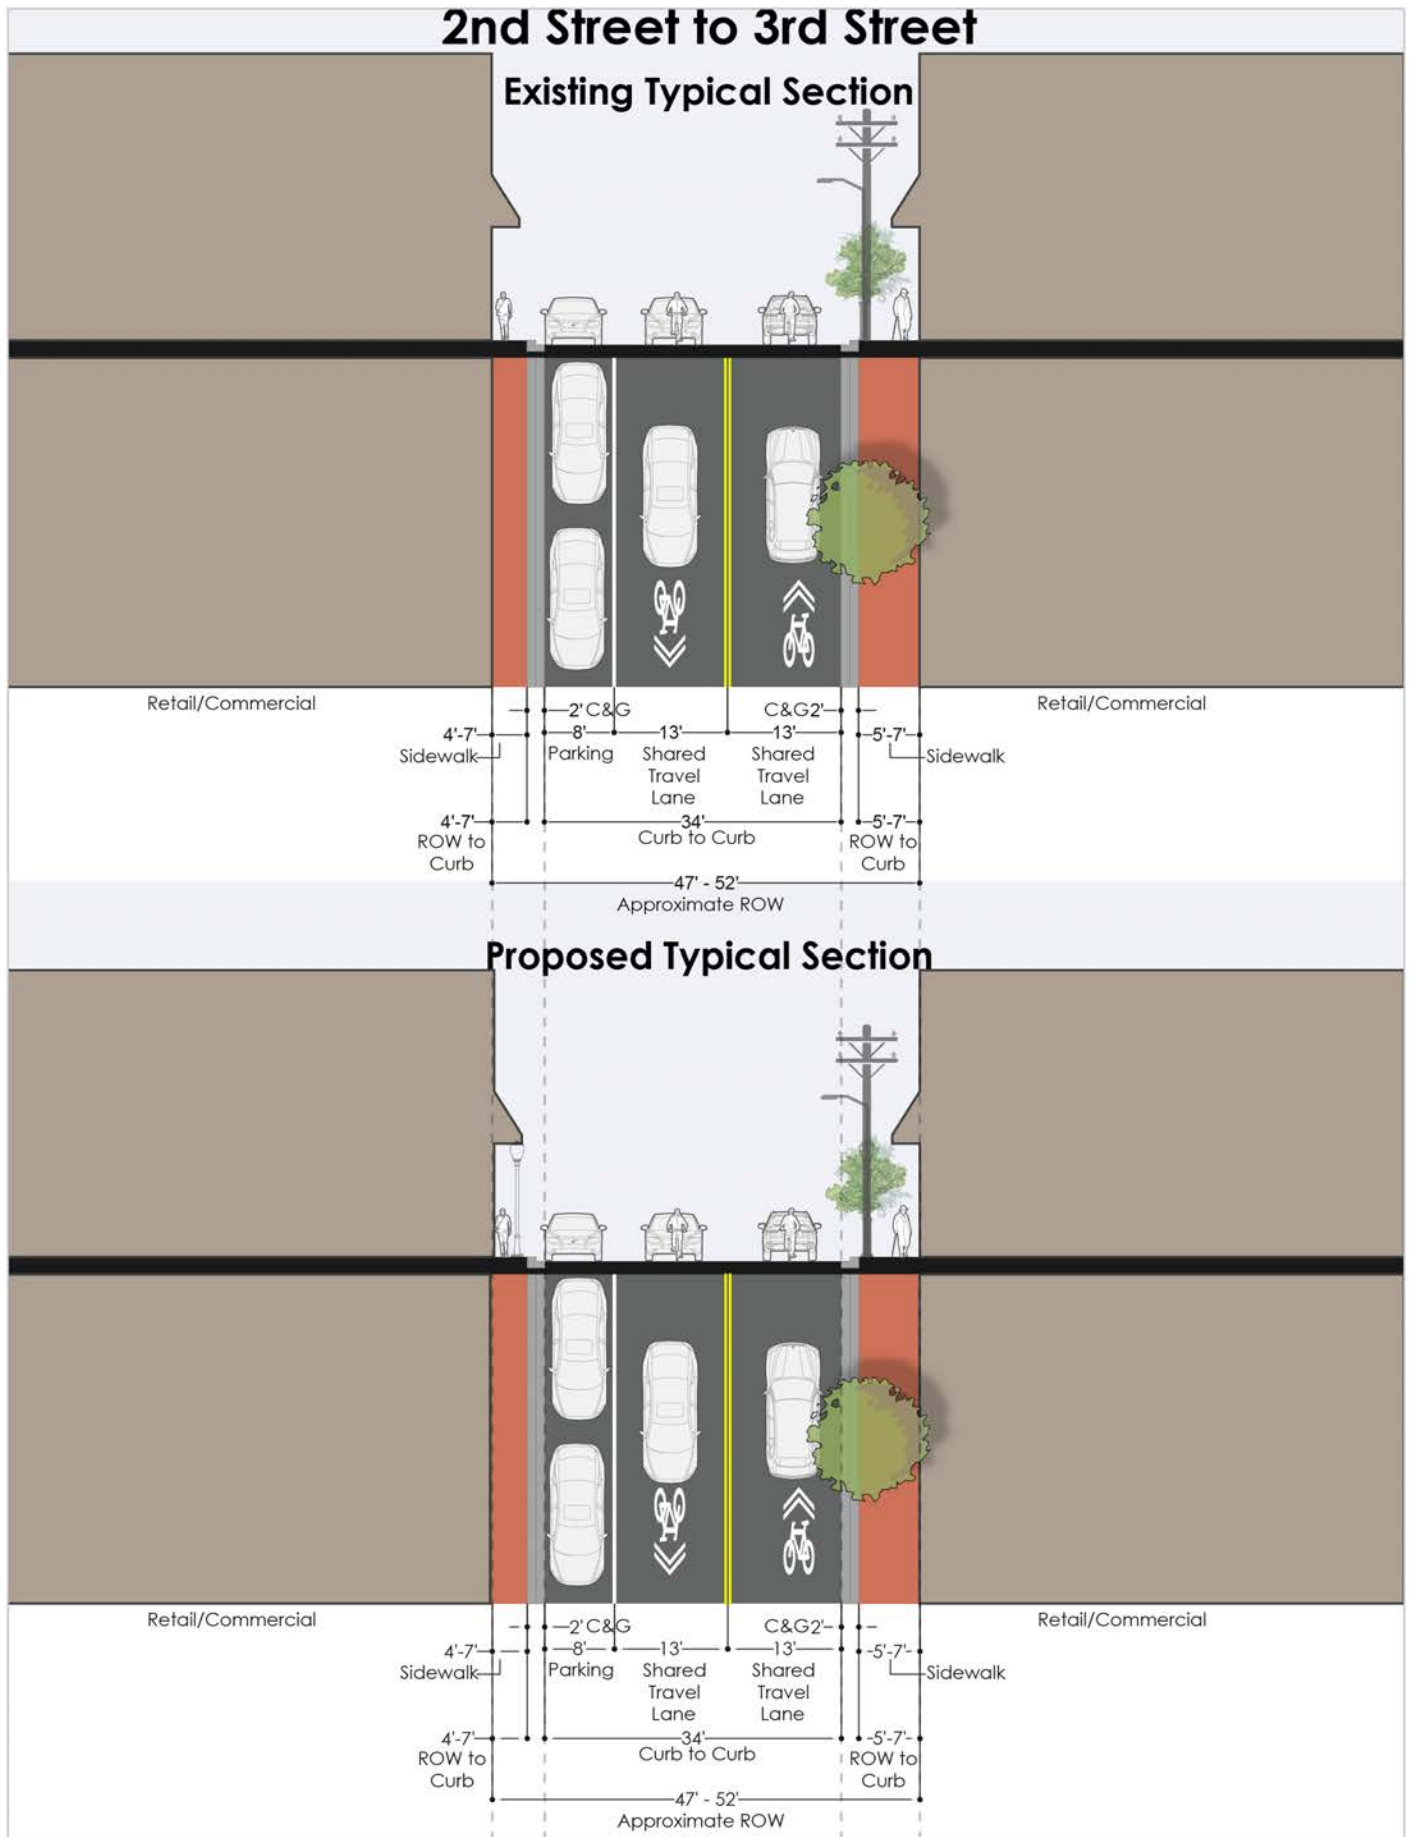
Existing and Proposed Typical Section - 2nd Street to 3rd Street (No Change)
